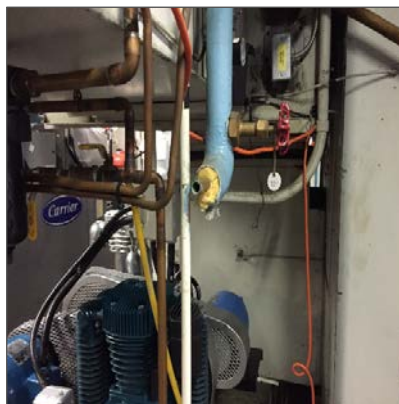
Damaged asbestos-containing parging cement on pipe fitting, Basement Mechanical Room, ER Wing.
